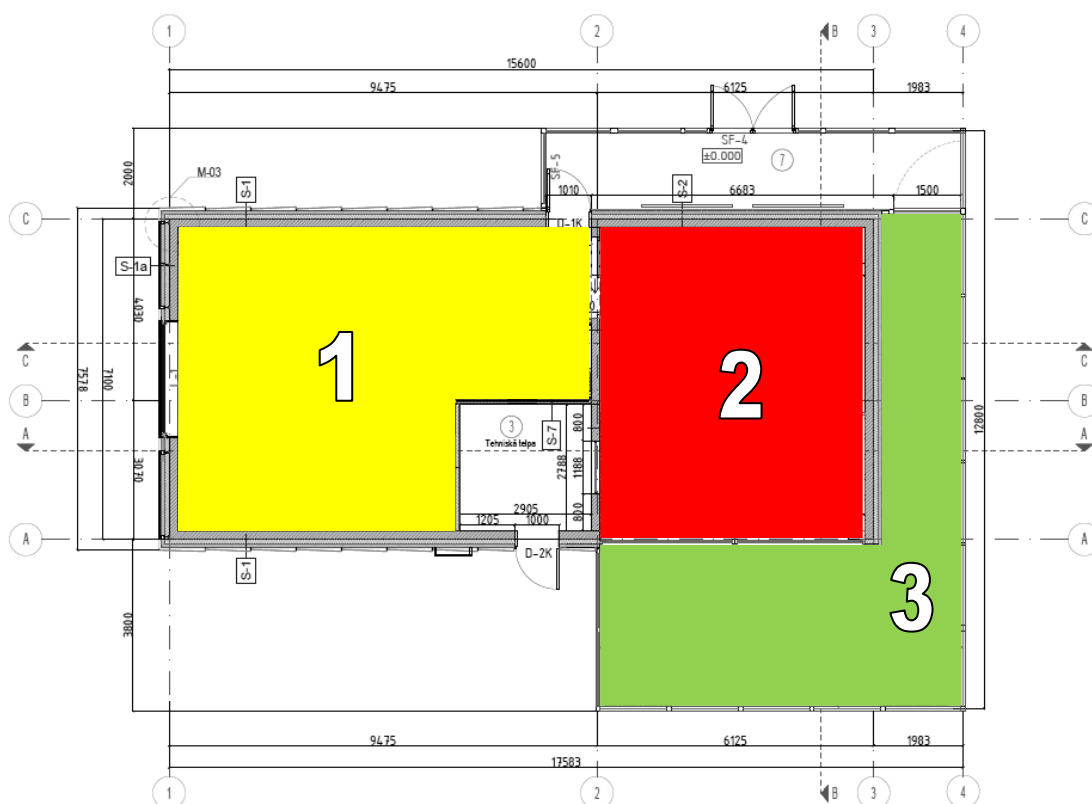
Floor plan of the nZEB Philanthropy house” (currently in the design stage): 1 – office part, 2 – seminar room, 3 – winter garden.
